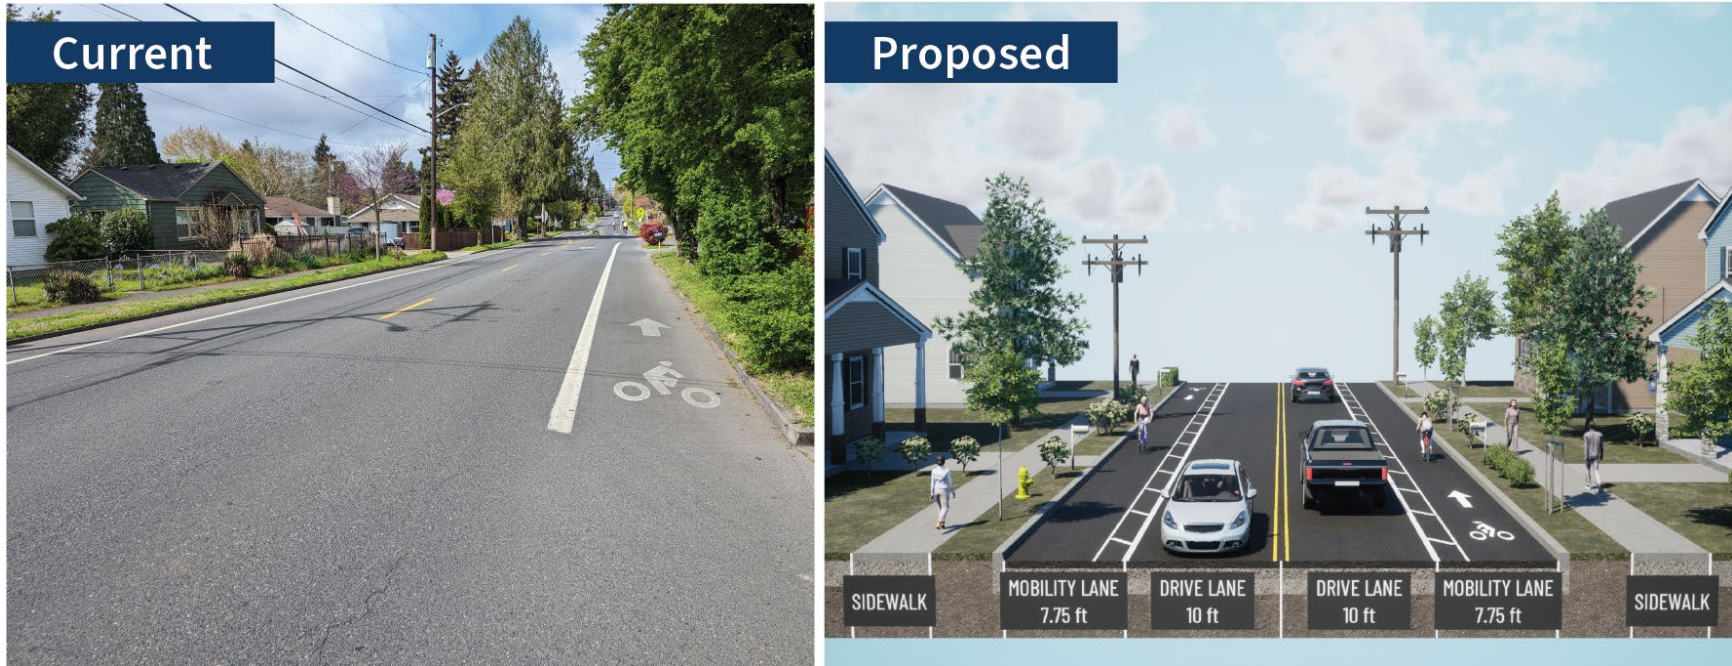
Current and Proposed 33rd Street Cross Section between I-5 and St. Johns Boulevard
